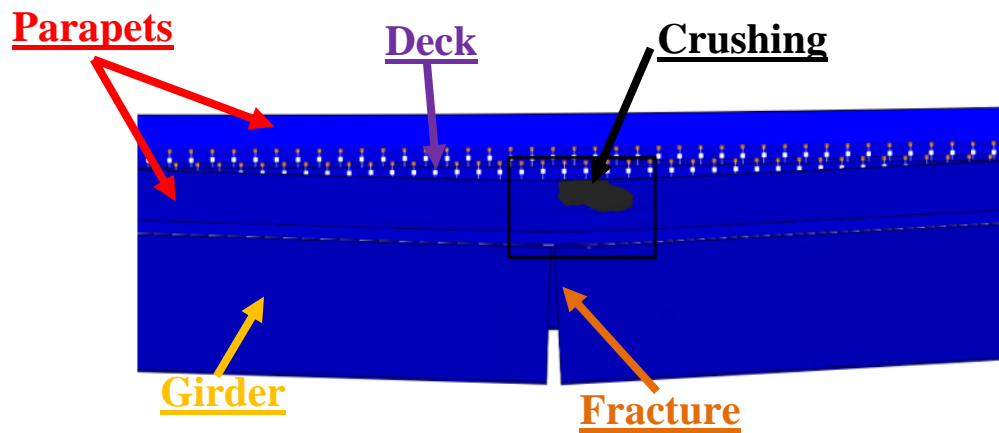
Parapet crushing in the typical simple span bridge (side view)
